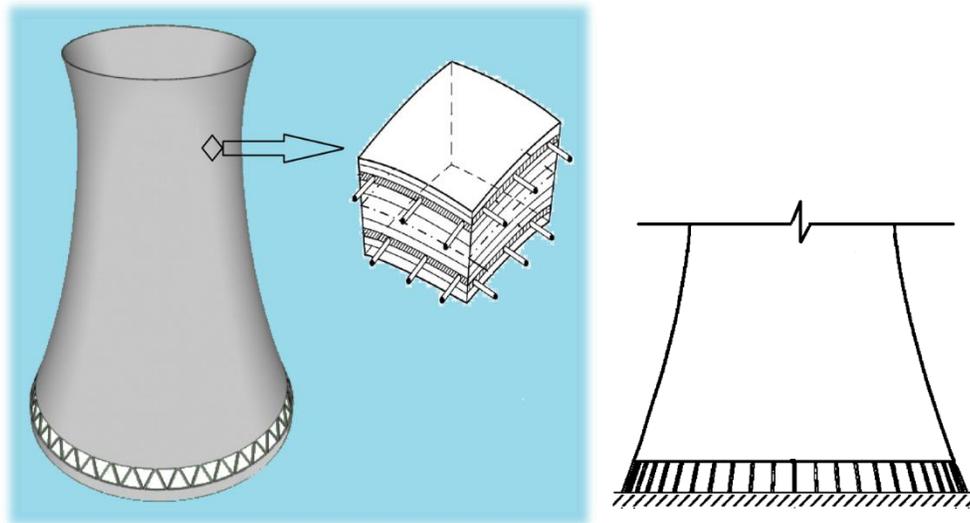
A schematic image of the structure element detail (left) and column connections (right) of cooling tower.
